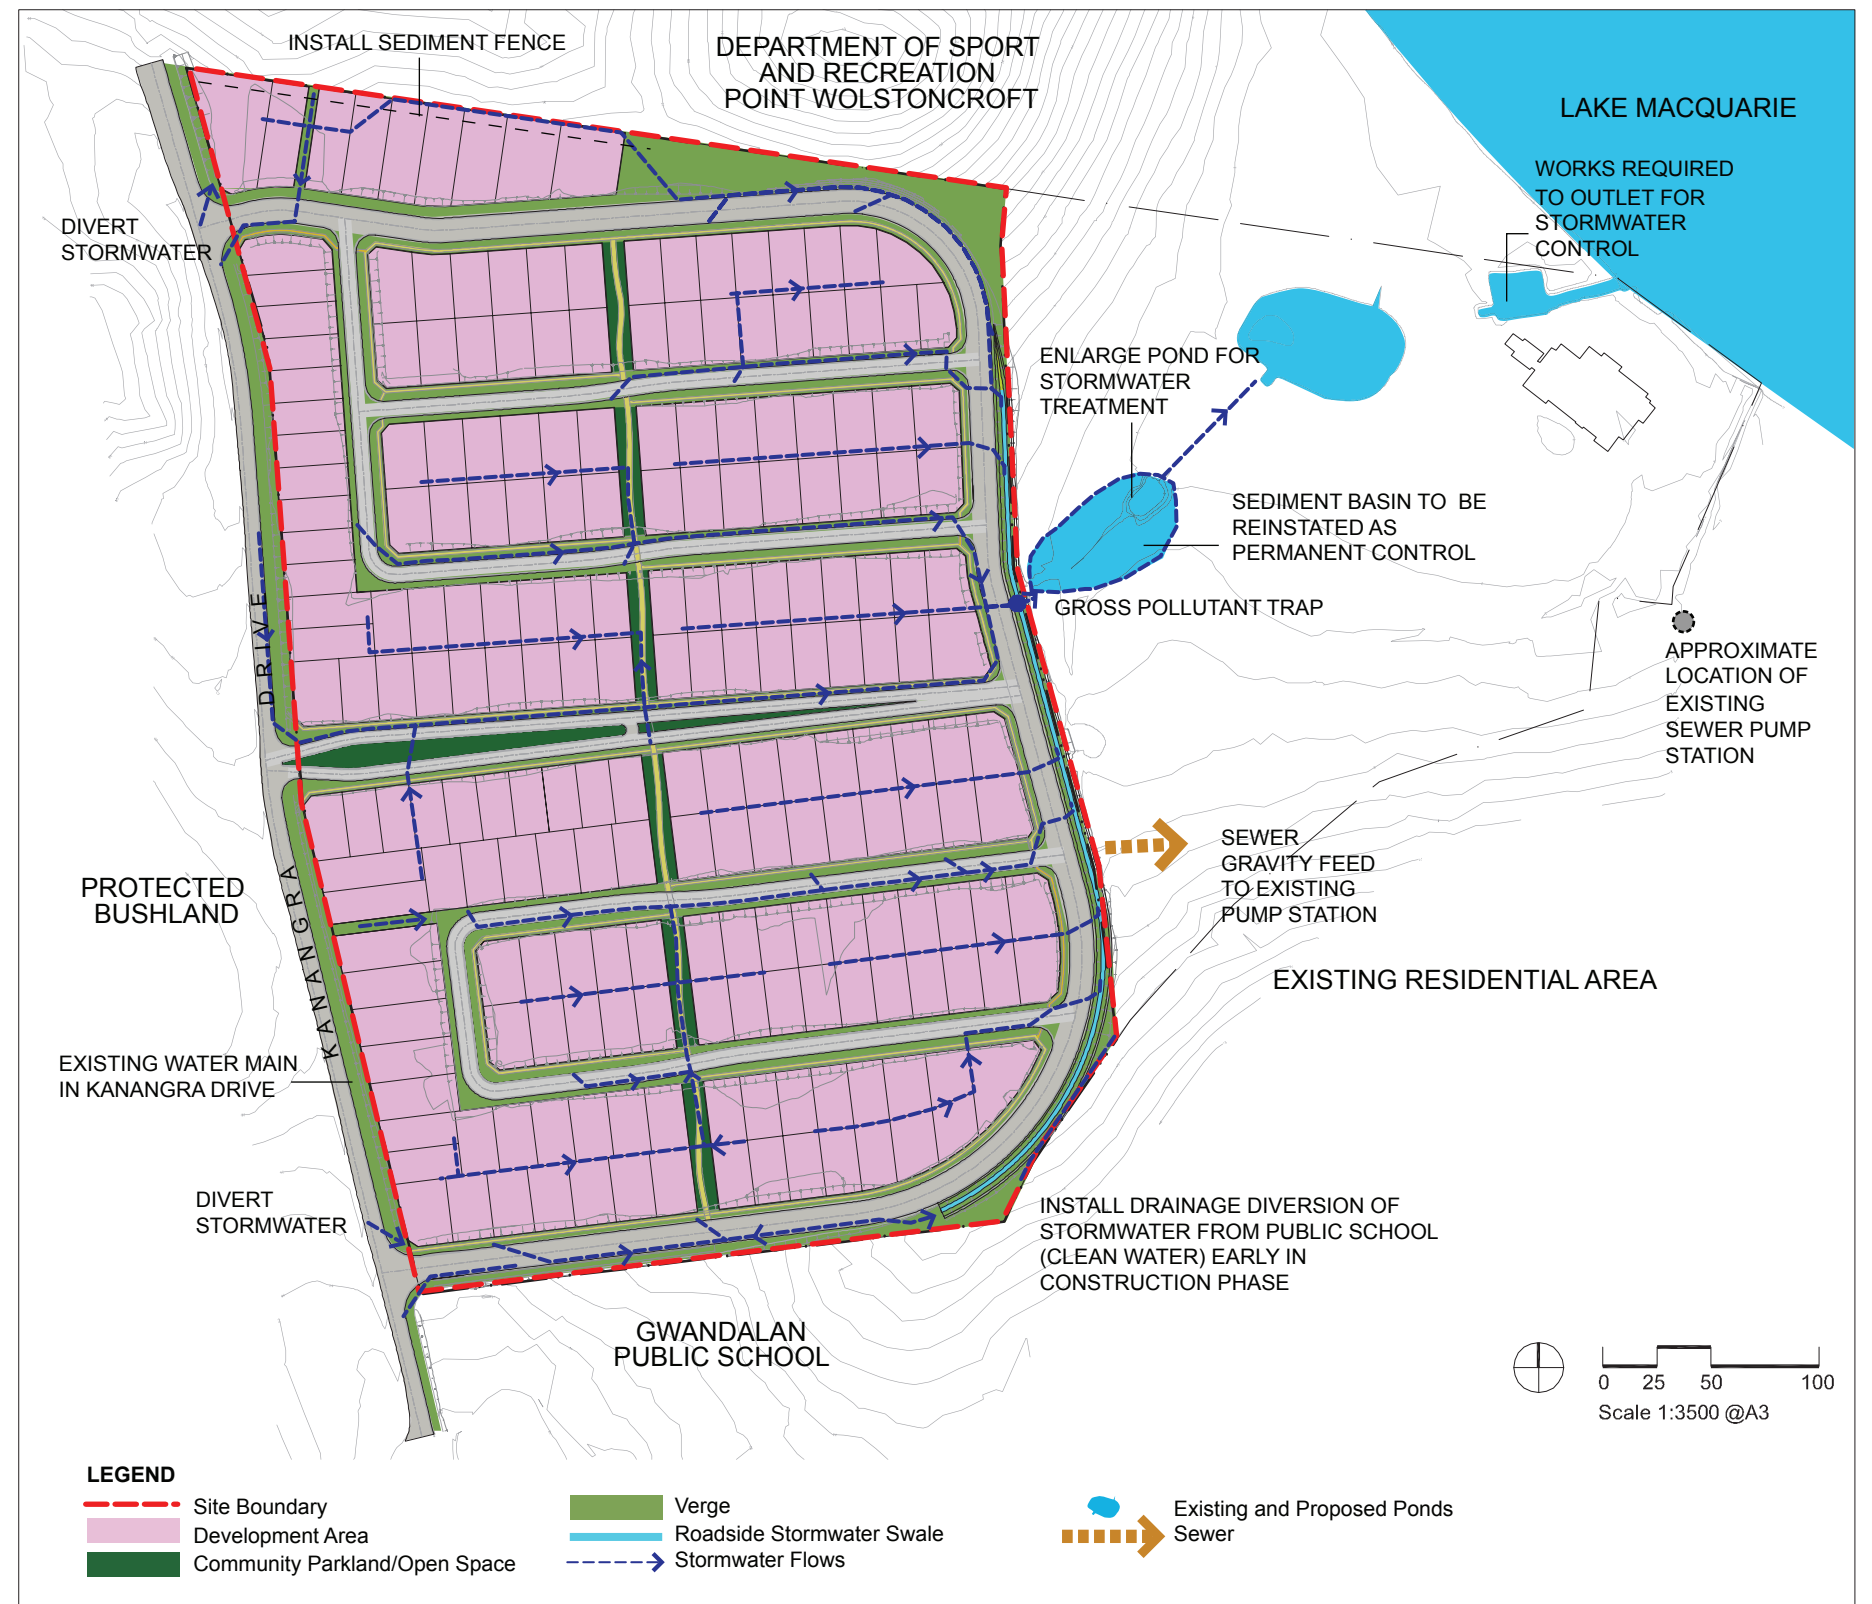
Gwandalan Stormwater, Sewer and Water Concept Plan.
